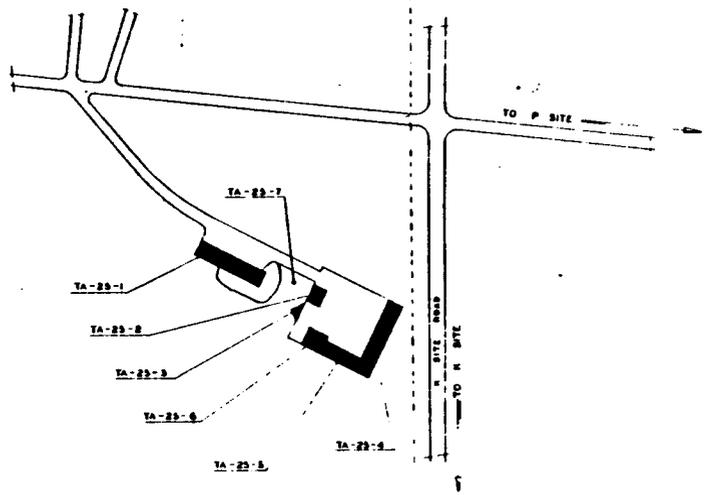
Structure Location Plan for TA-25 - V Site
